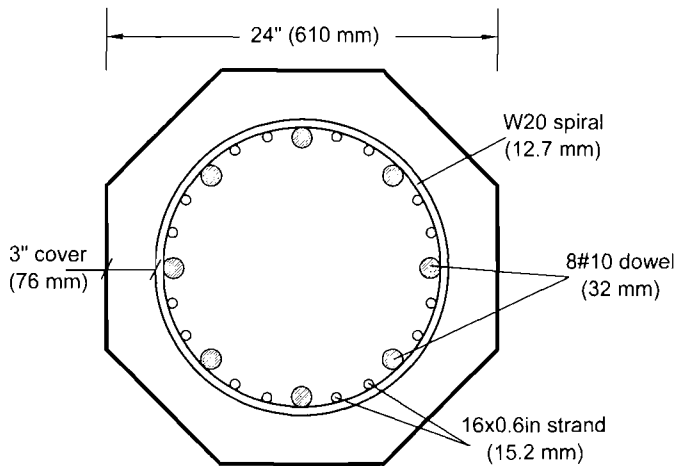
Typical POLA 610 mm Octagonal Prestressed Pile Details
